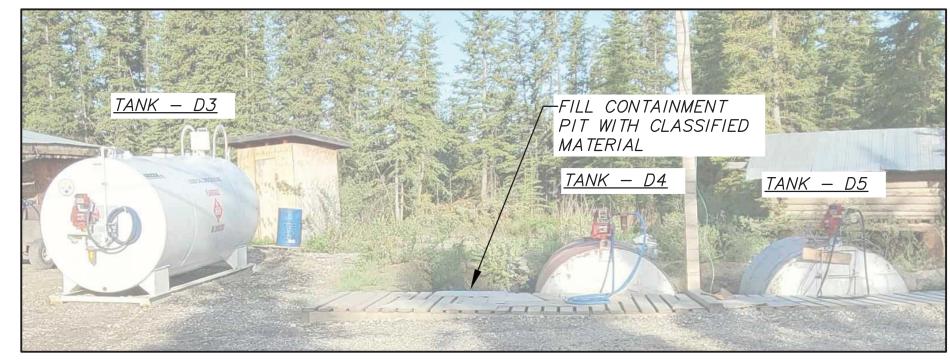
EXISTING RETAIL DISPENSING STATION, SUMMER 2021
